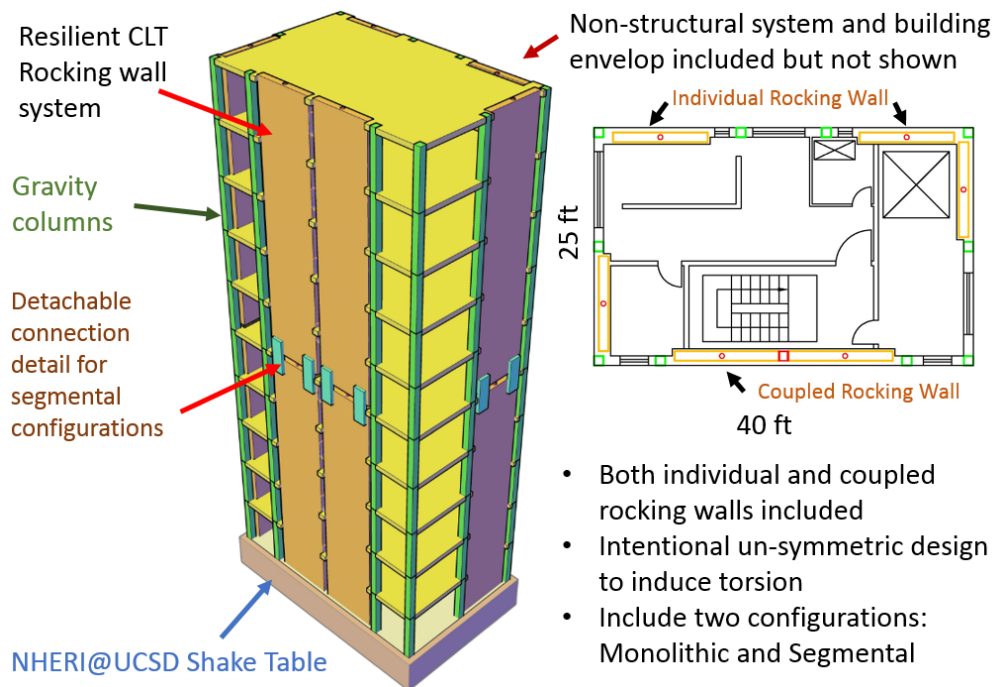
Concept of the 10-story full scale test at NHERI@UCSD facility
